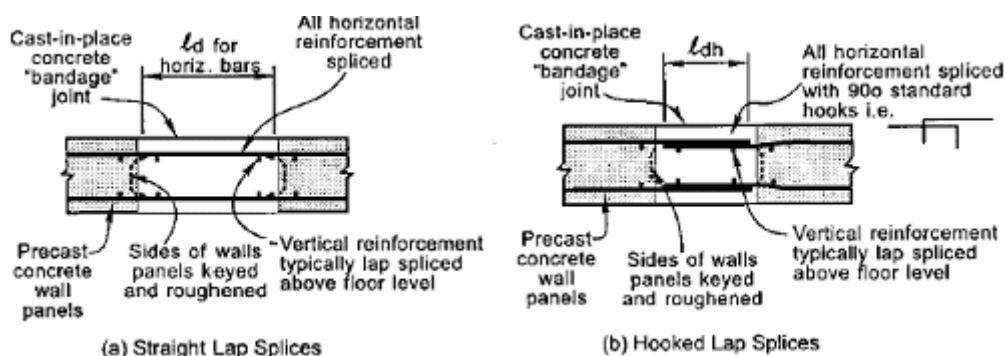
Vertical joints for equivalent monolithic precast reinforced concrete structural wall construction type a and b [12]
